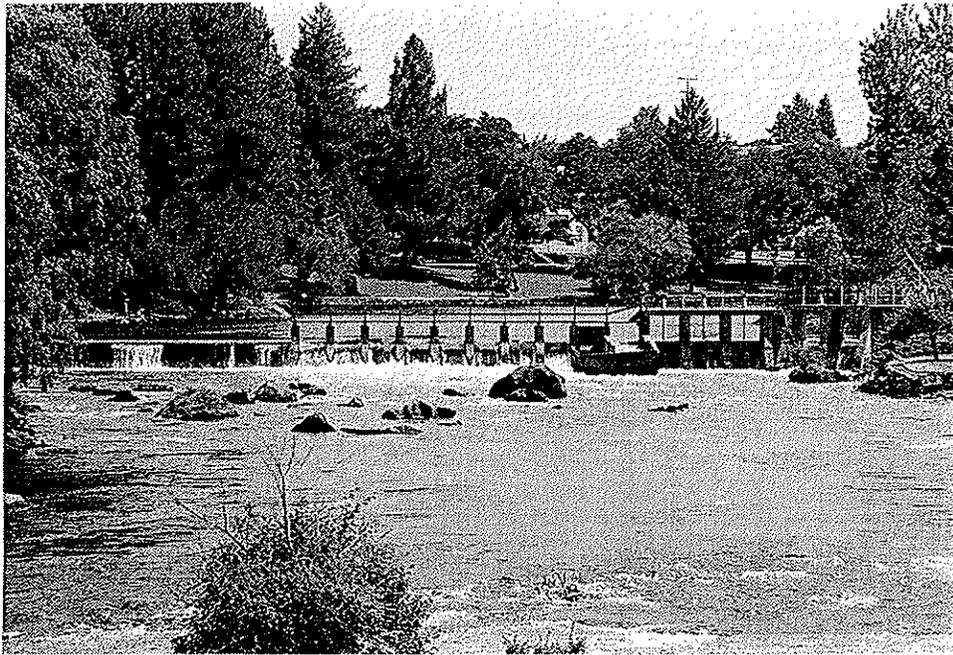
The Bend Feed Canal heads at the Bend Diversion Dam, a concrete gravity overflow type dam.
